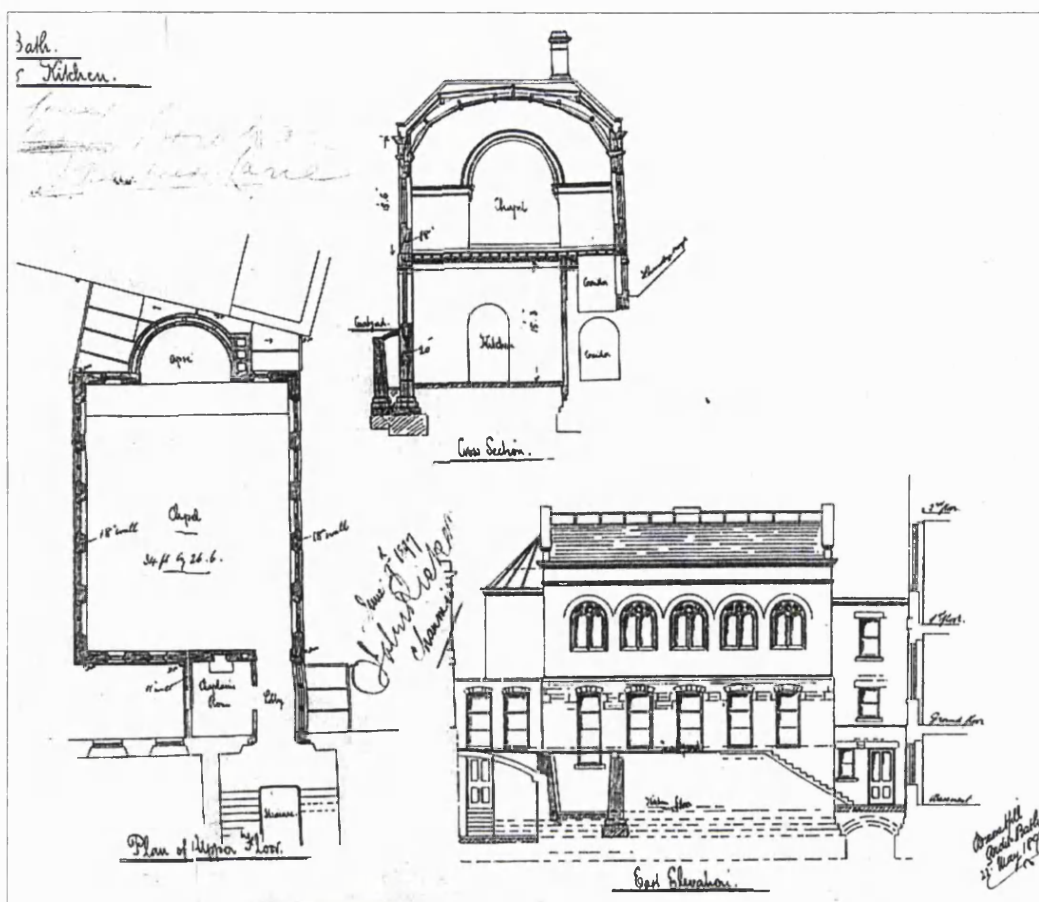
Royal United Hospital Chapel, (with kitchen under). detail from Building Control Plan, dated 25 May 1897, signed Browne & Gill. The basic chapel plan, rectangular room with an semi-circular apse follows that of earlier Practice chapels; here with a semi-elliptical ceiling.
